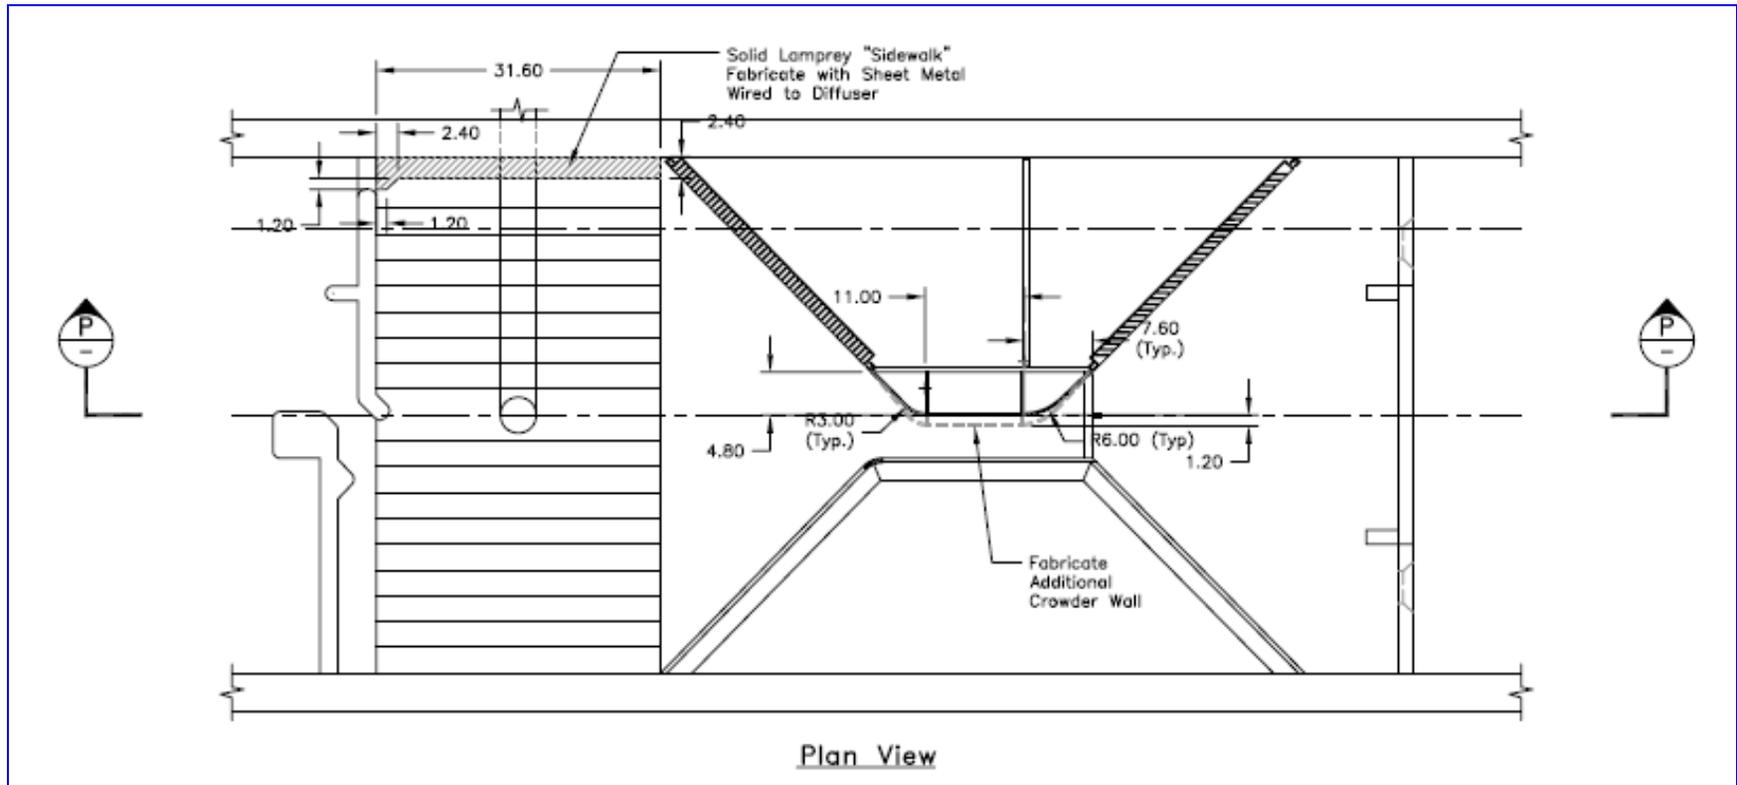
Count Station – Plan View Excerpt from Model Drawing 3-19 provided by ENSR (Inches Model Scale: 1:5)
